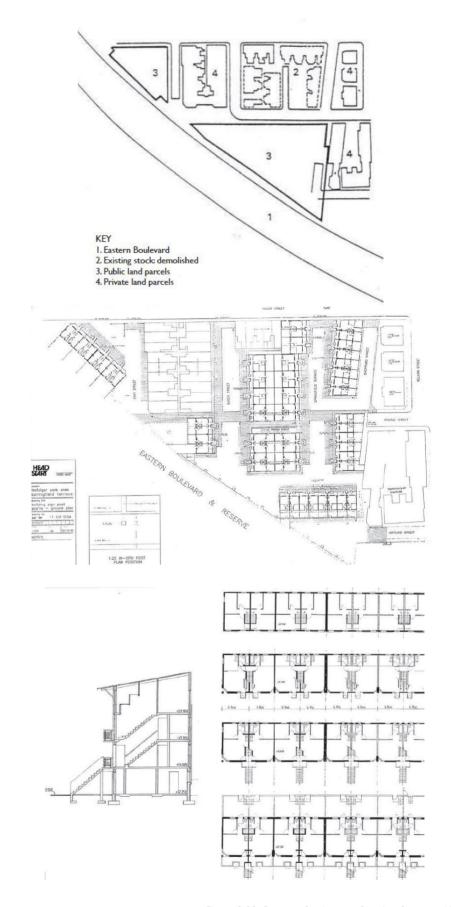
From top, Site location, Site plan, Section and Unit plan (Tonkin, 2008)
